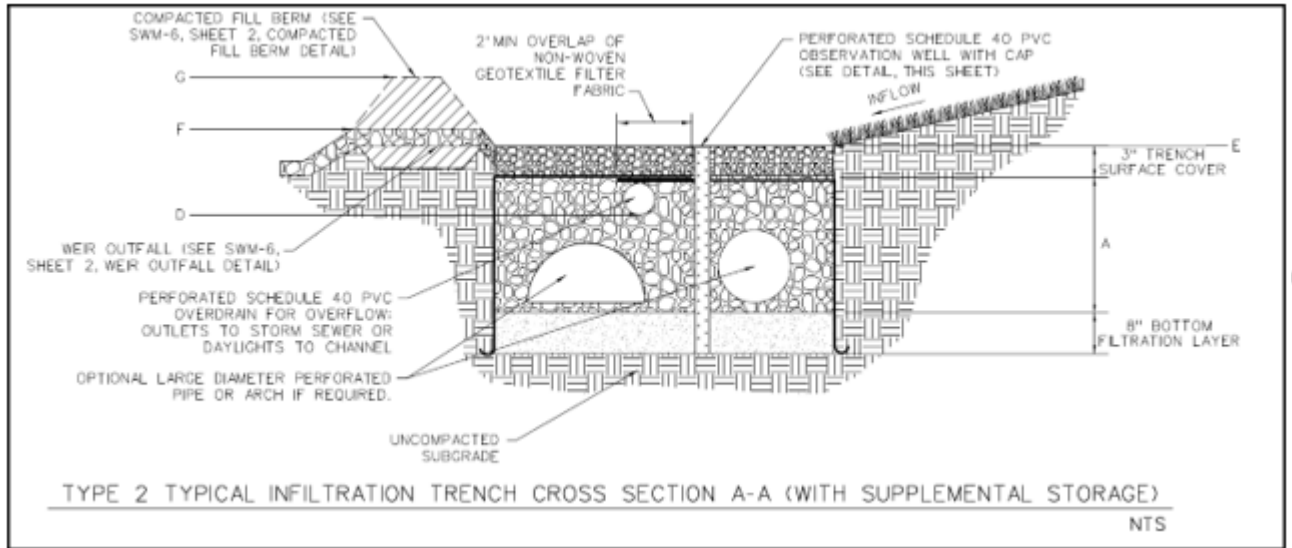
Infiltration Trench Cross Section (with supplemental storage)
